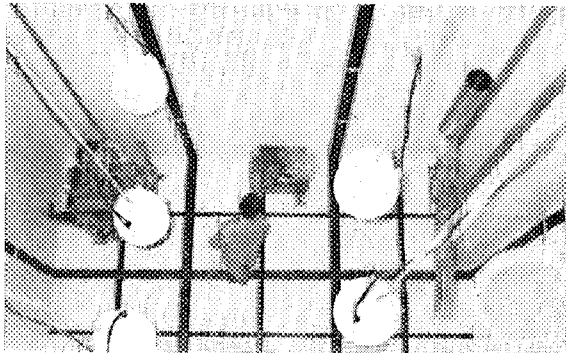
Inside of JRR-2 irradiated fuel storage pool (Before setting stainless steel plate on the bottom of pool)
